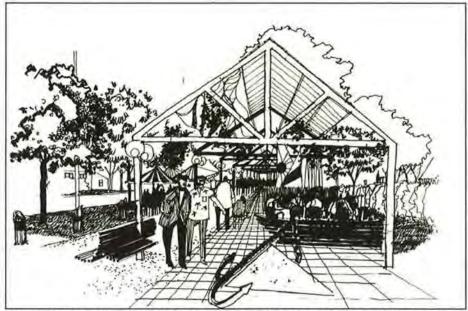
Jackson's Point CAUSE Plan - sketch of the linear portion of Bonnie Park (Ontario Association of Architects)
